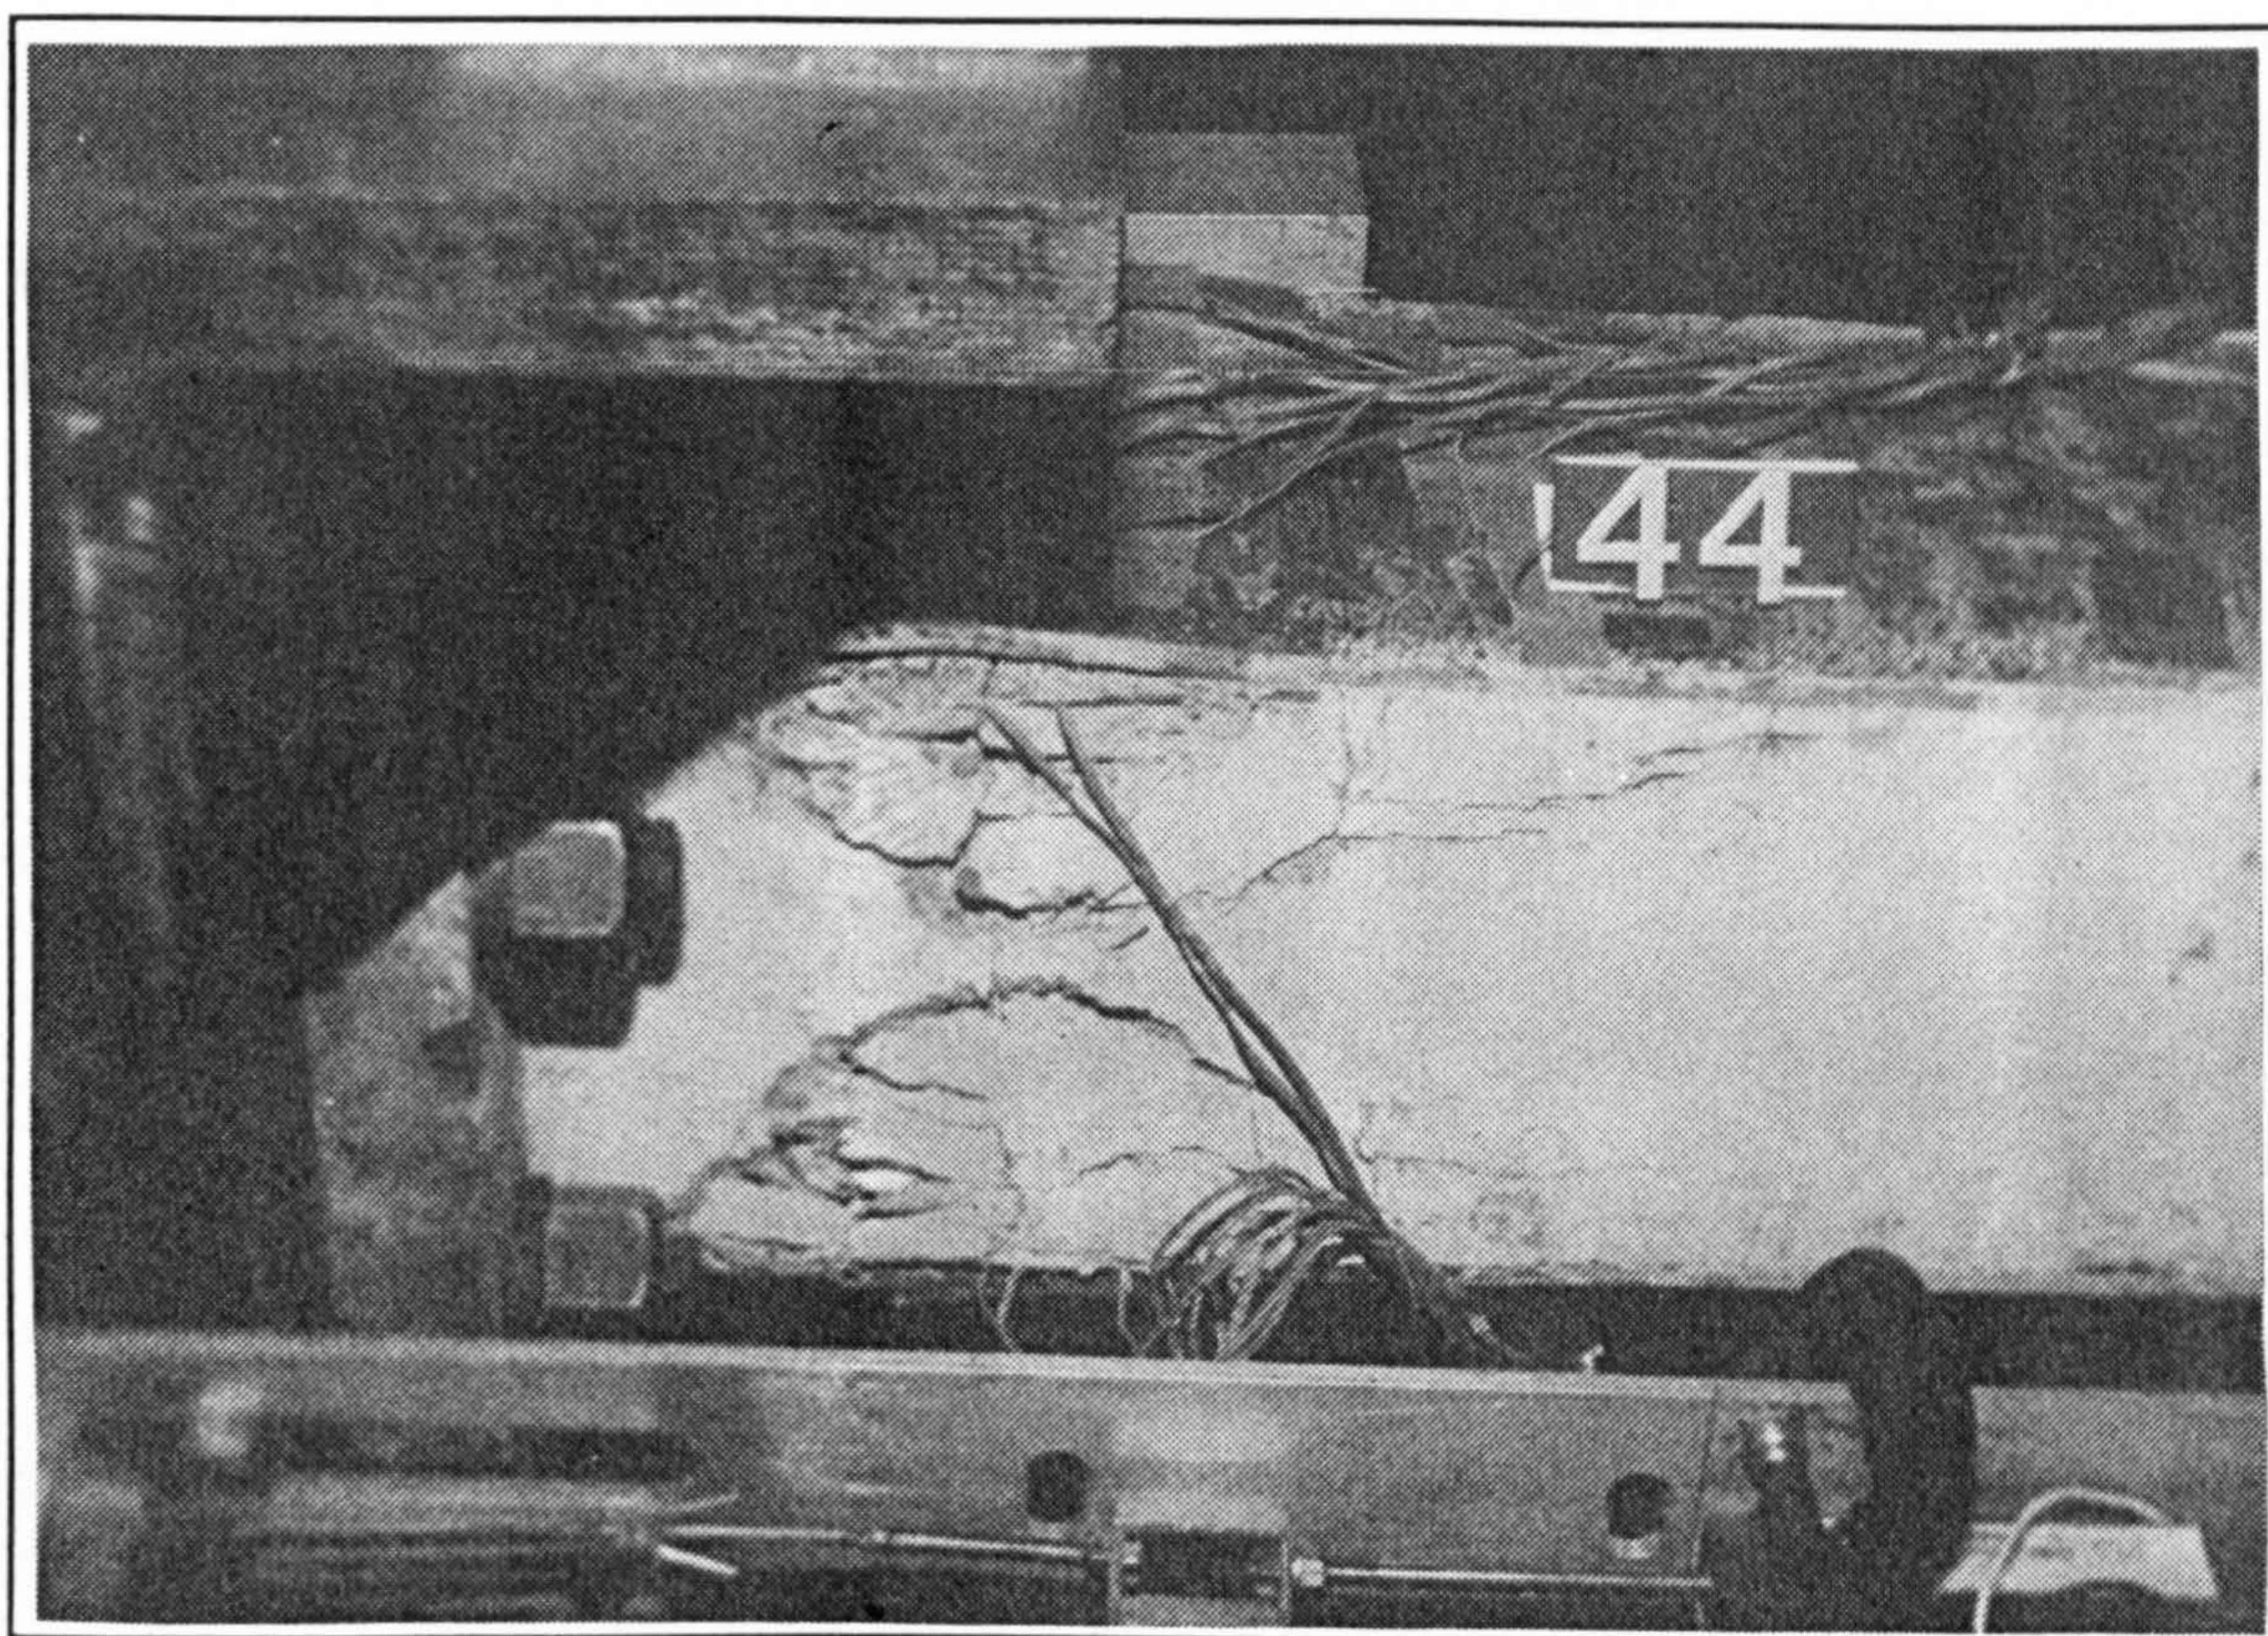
EM02 at 44 mm, crushing of concrete following local buckling
